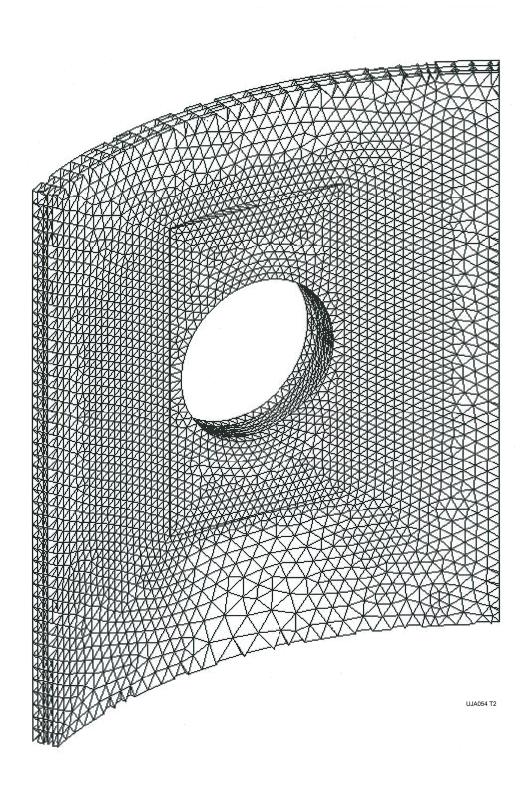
E.1-9—Cross-Section of Equipment Hatch Area
